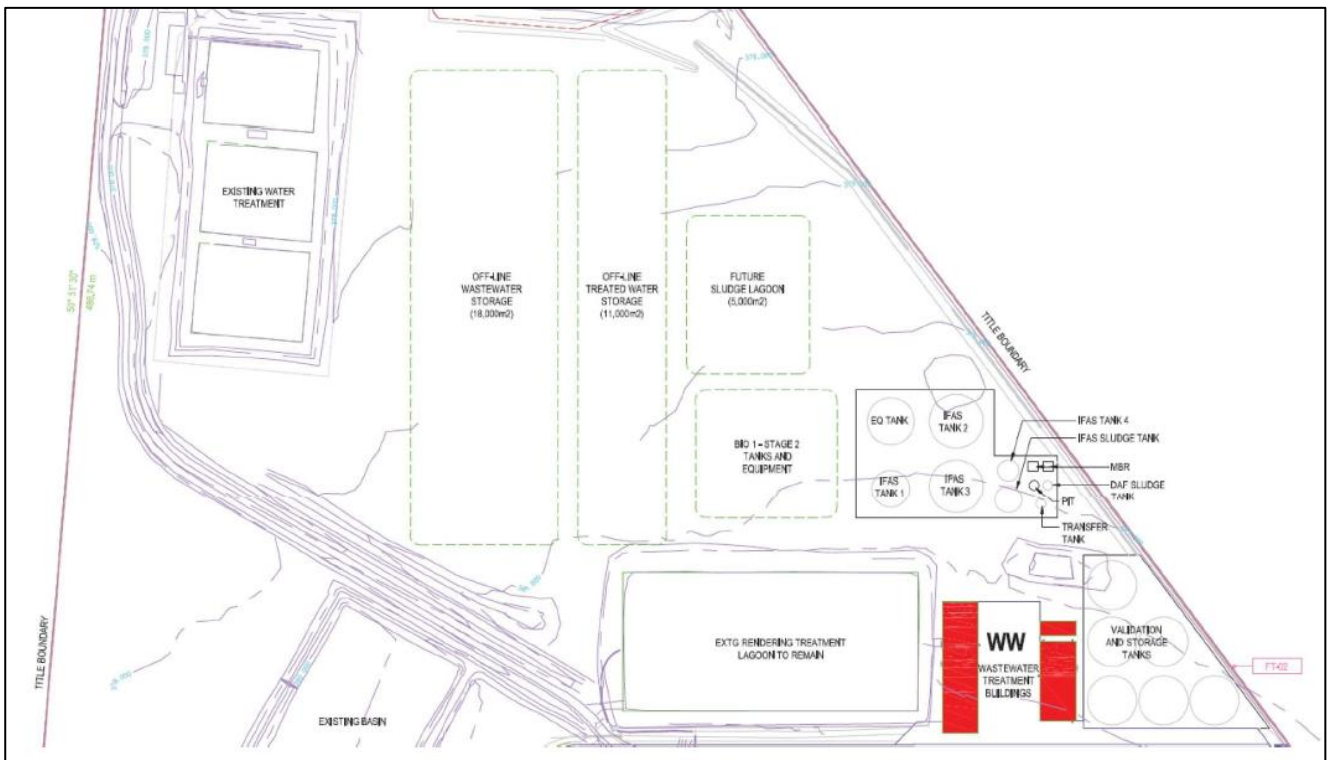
Concept Wastewater Treatment Plant Layout (As Approved)
